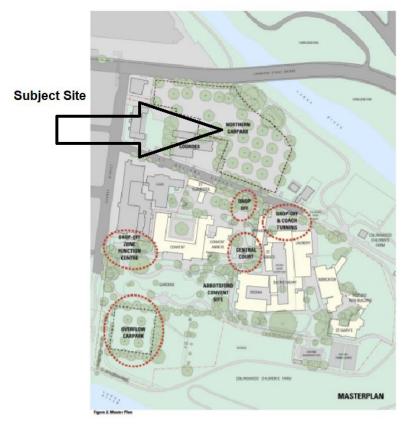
Abbotsford Convent Master Plan with car park area / subject site identified.
